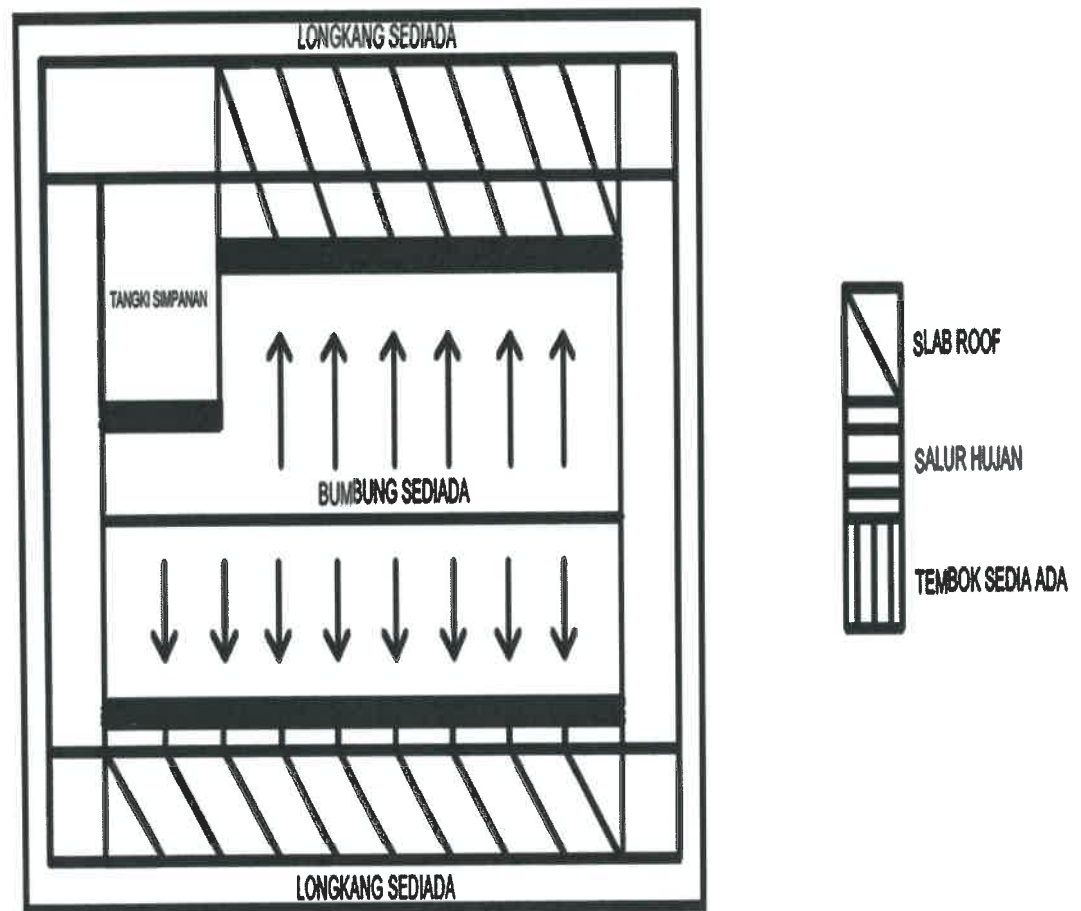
Plan view roof SAMB Masjid Tanah, Melaka
